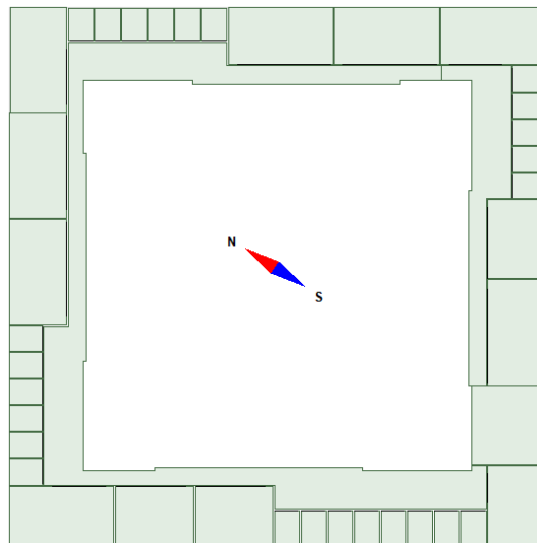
Floor plan with locations of office rooms for floors 3 and 4.
